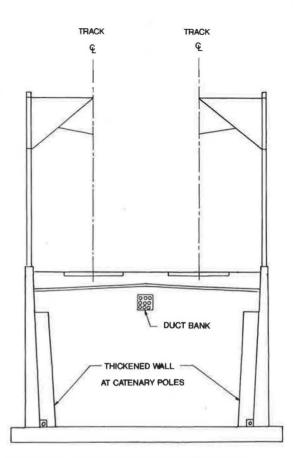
Typical section, retained fill bridge approach at catenary poles.
